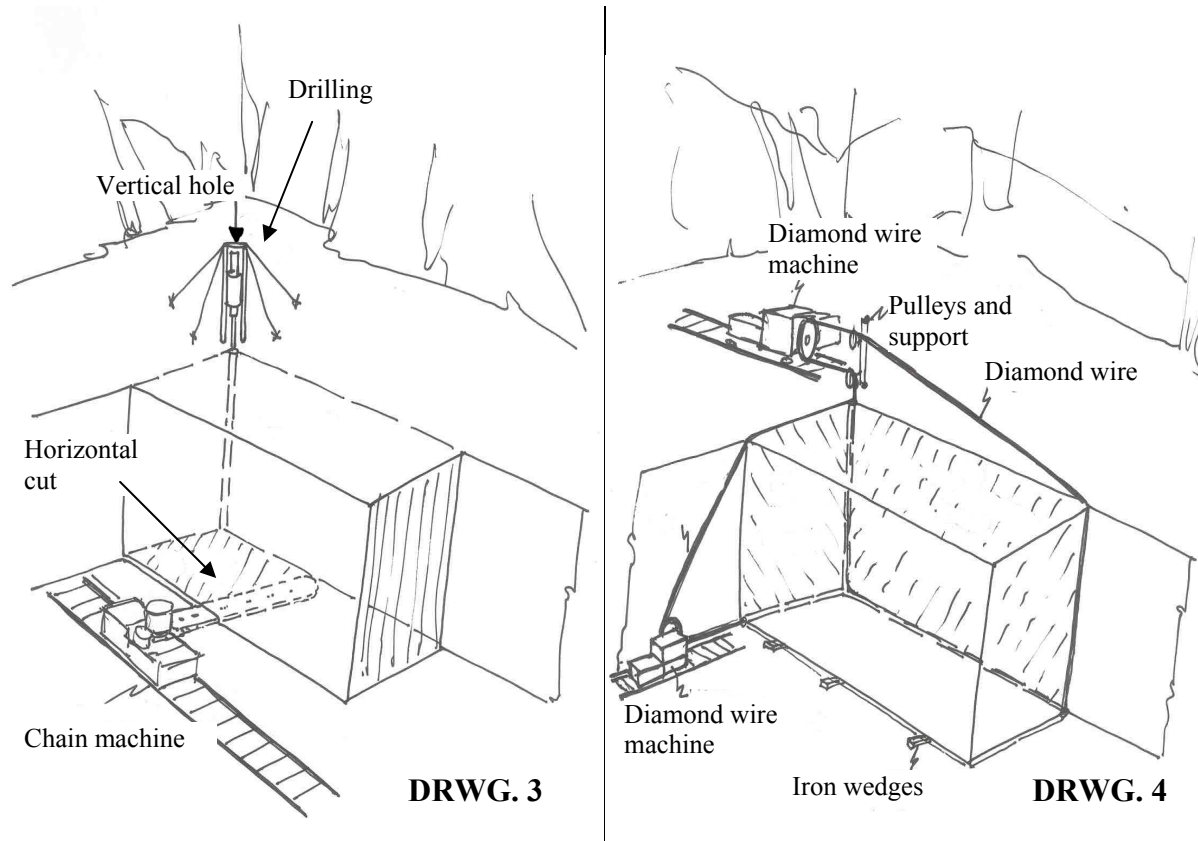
Method Type B2– Use of two types of cutting machines combined with drilling
